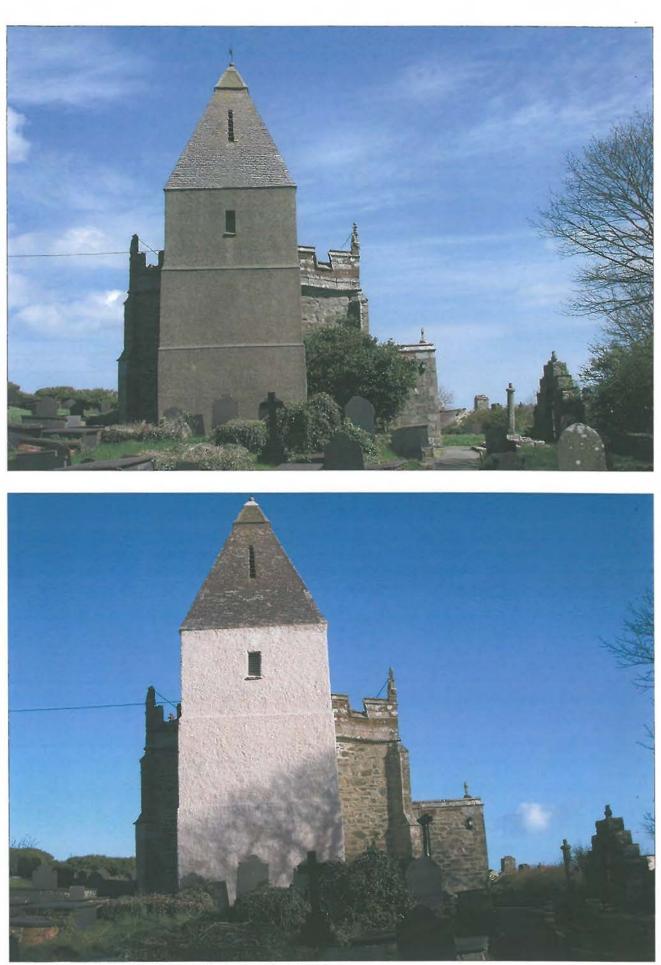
Fig. 15 The Church, west elevation before and after conservation
